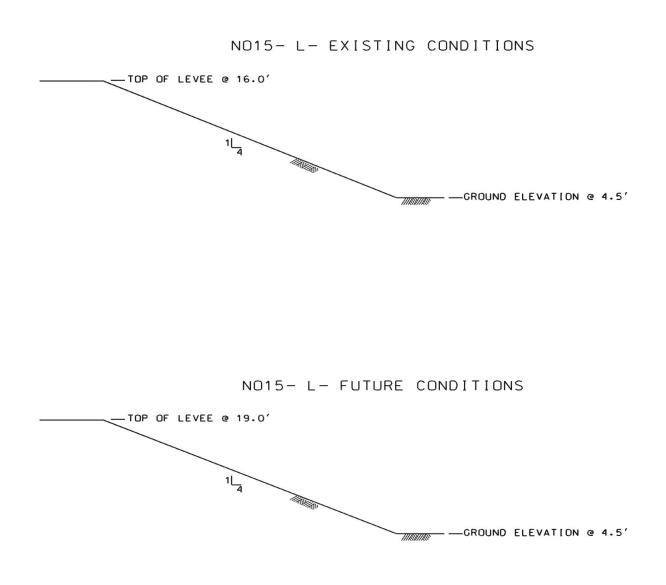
Typical Levee Design Cross-sections New Orleans – Metro Lakefront Levee (NO15-L)
